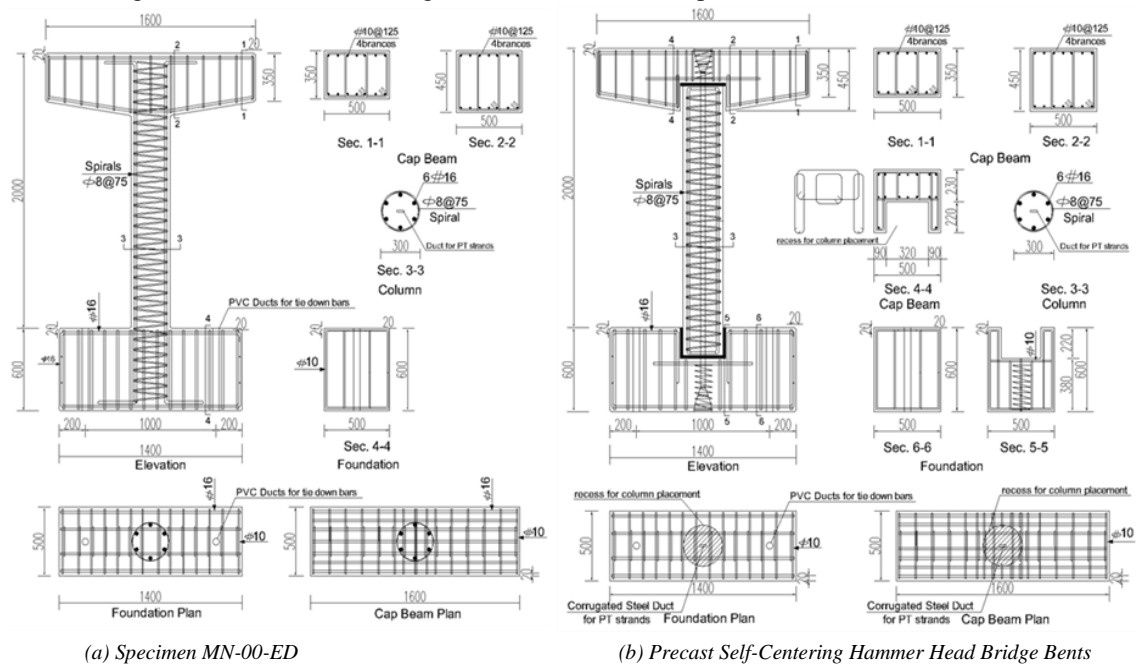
Specimens Dimensions and Details (Dimensions in mm)
